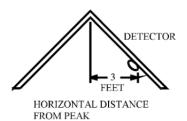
The installation position of the cigarette alarm on the pitched roof
